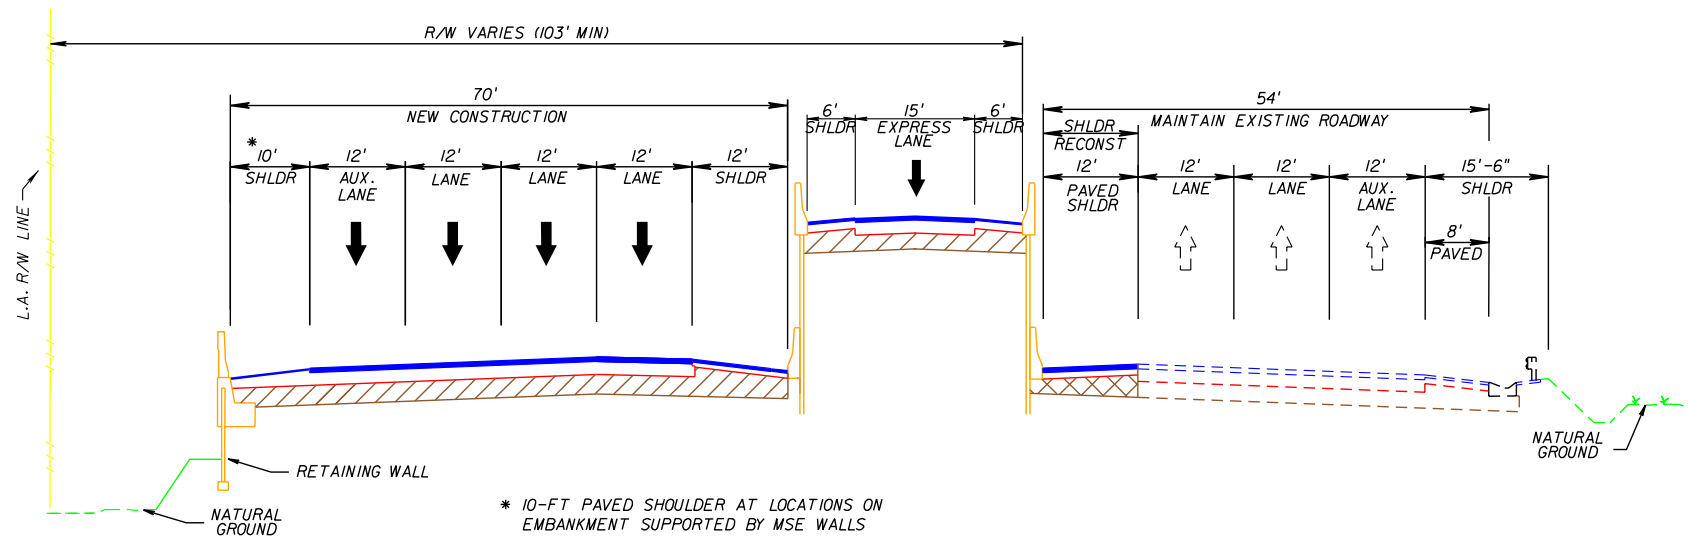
Proposed Typical Section - Turnpike Connector - Alt. 3C
